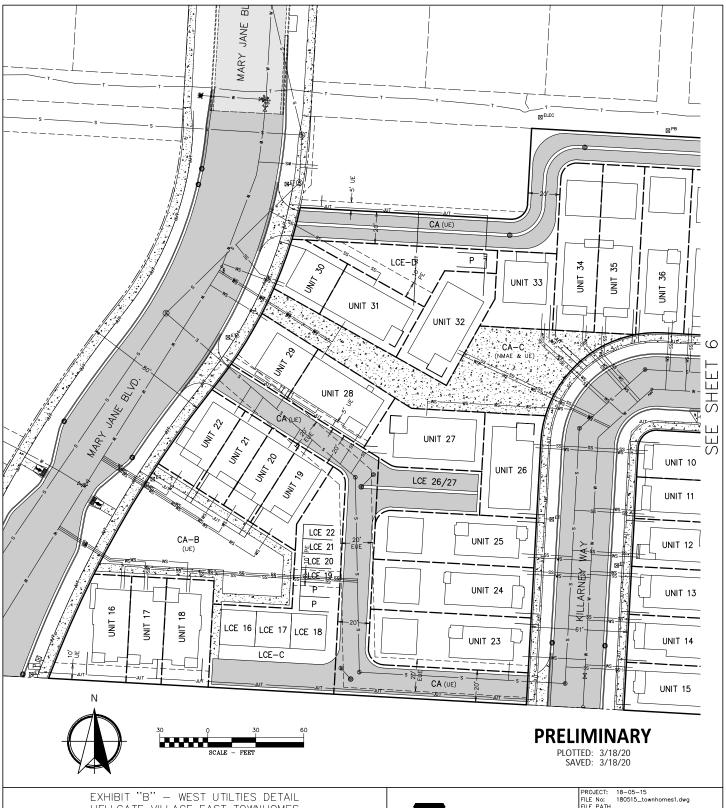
EXHIBIT "B" — WEST UTILTIES DETAIL HELLGATE VILLAGE EAST TOWNHOMES (LOTS 1 AND 2, HELLGATE VILLAGE SUBDIVISION) LOCATED IN THE NW 1/4 OF SECTION 18, T. 13 N., R. 19 W., P.M., M. MISSOULA, MONTANA
